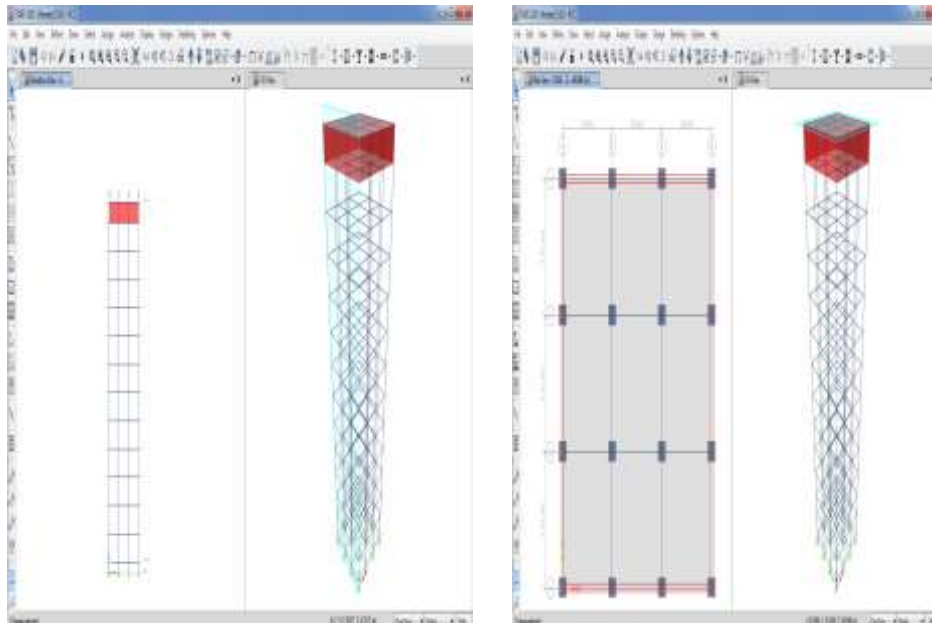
Elevation and plan of Model of RCC and encased column composite water tank in ETABS
